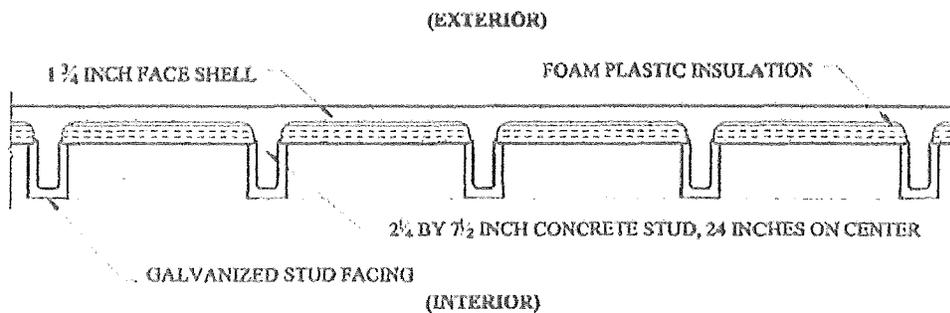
TYPICAL SUPERIOR WALL HORIZONTAL SECTION DETAIL
